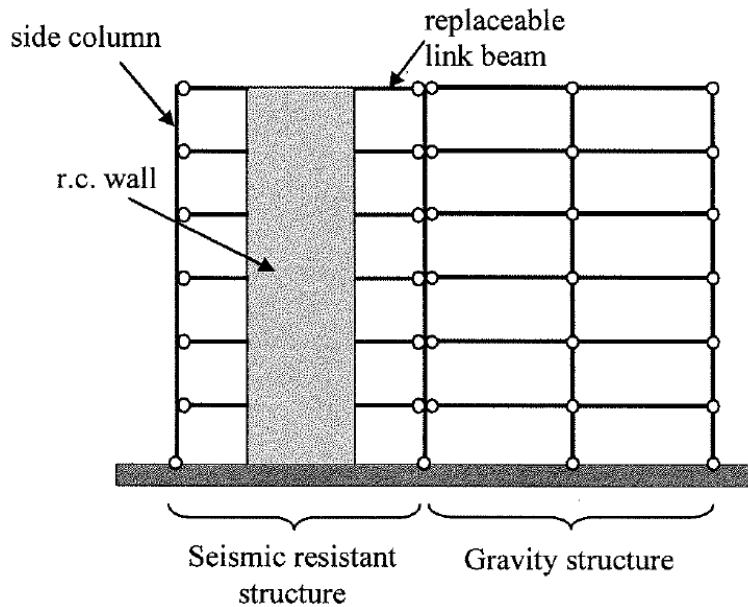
Example of innovative hybrid coupled shear wall system connected to a gravity-resisting steel frame with pinned beam-to-column joints.
